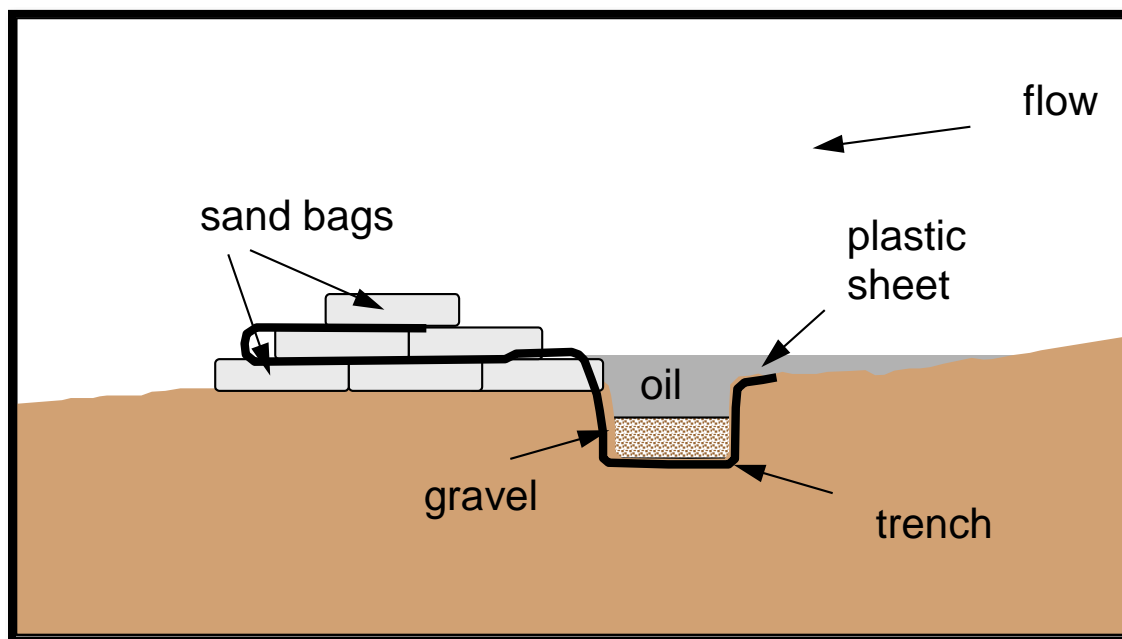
Construction of a berm with sandbags and plastic to contain a spill in a trench
